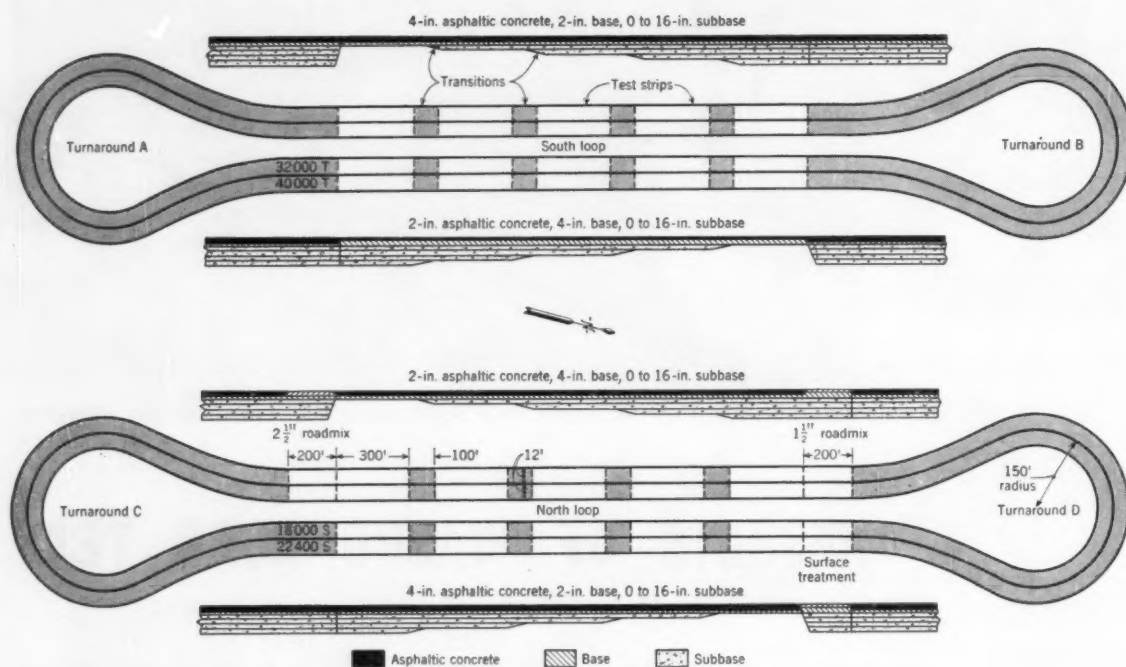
Two test loops, North Loop and South Loop, were of same size in plan, with asphaltic concrete surfacing, base, and subbase varied as shown. (Taken from Fig. 1, p. 211, "The WASHO Road Test, Part 2," Highway Research Board Special Report 22.) South Loop carried all tandem-axle loads (32,000 lb on inside lane, 40,000 lb on outside lane) and North Loop all single-axle loads (18,000 lb on inside lane, 22,400 lb on outside lane).
